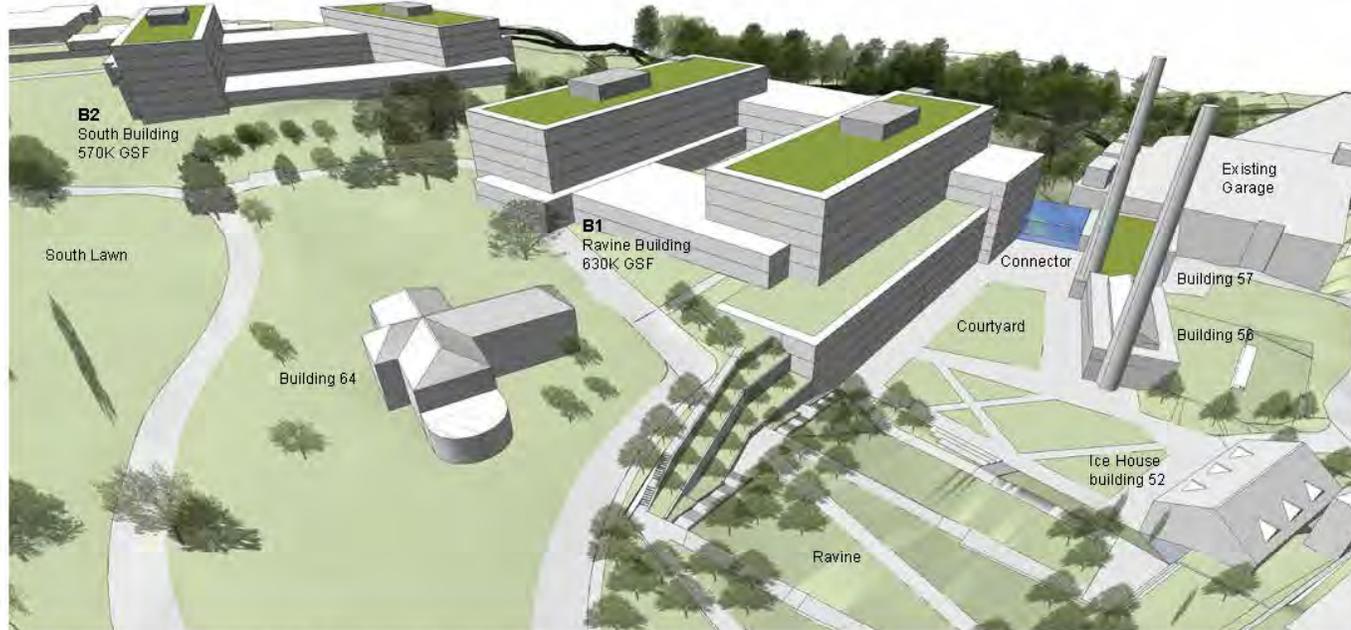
Preferred Alternative Plateau Site - Birds-eye view looking south from above Hitchcock Hall
